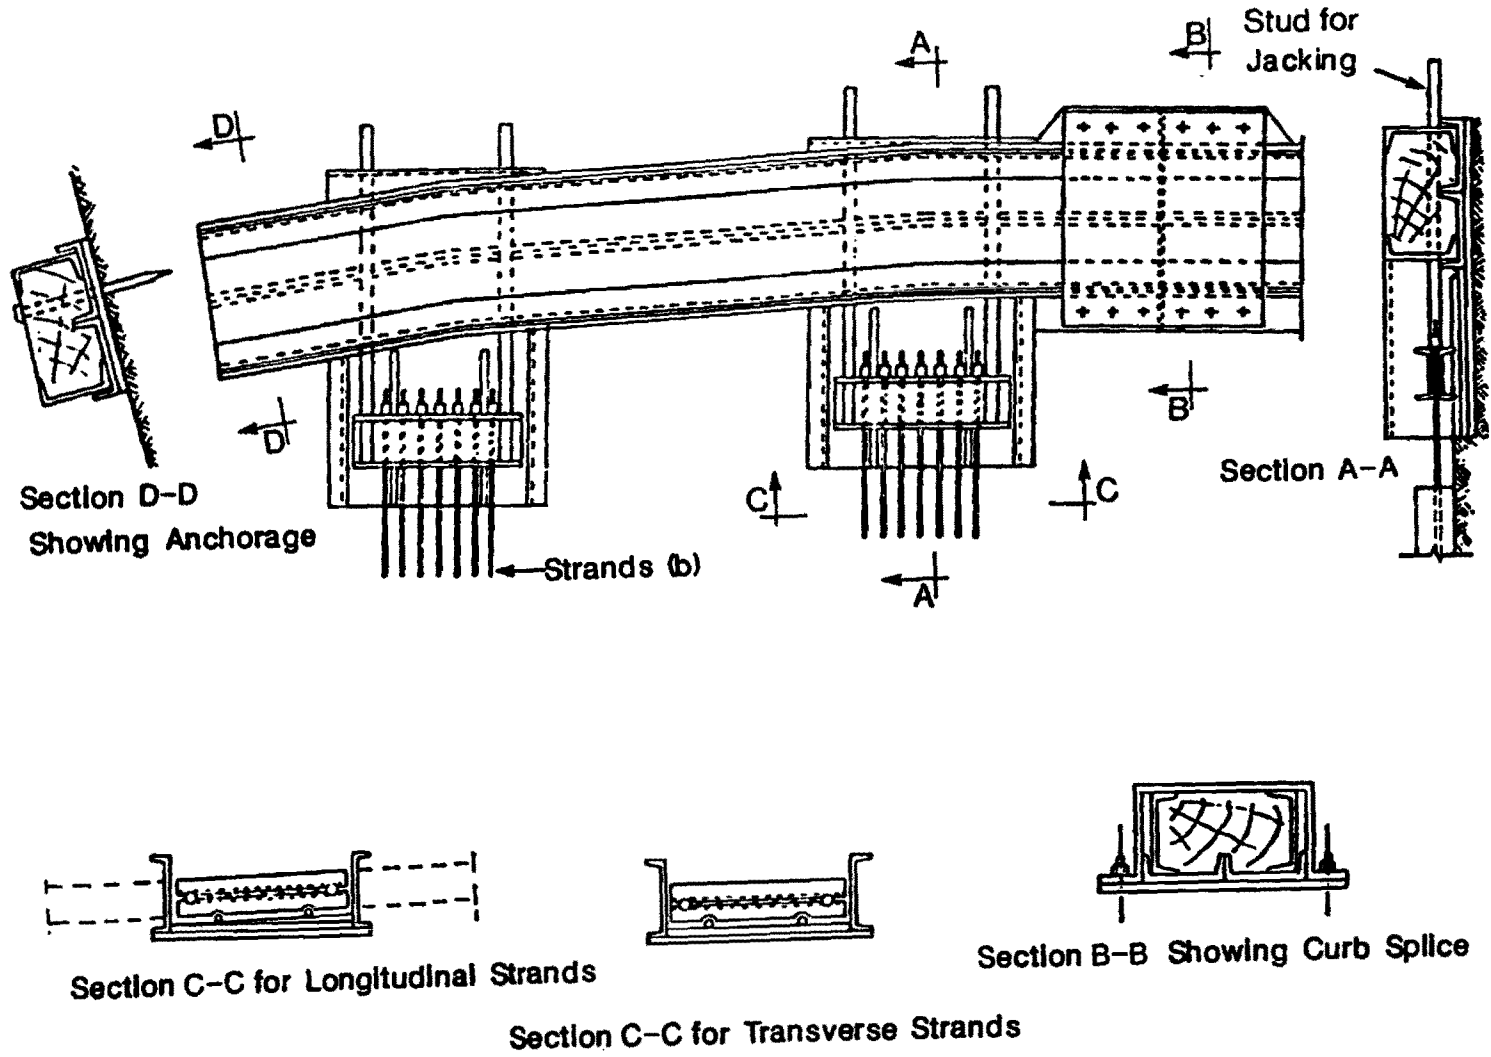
Details of portable abutment designed for use on pretensioned, prestressed pavement projects (Ref 136).
